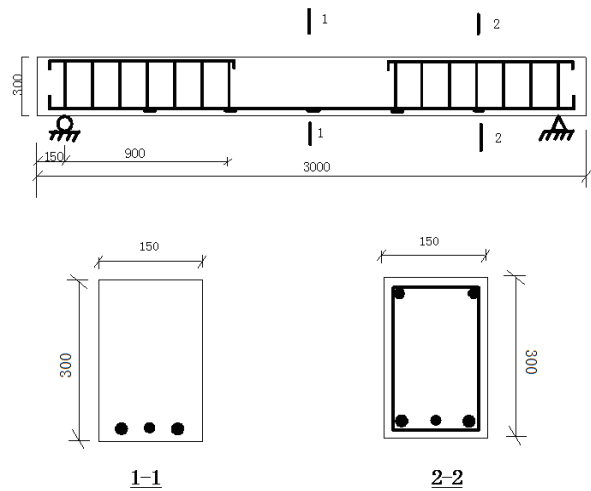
Detail sizes of the beam (all dimensions are in mm)
